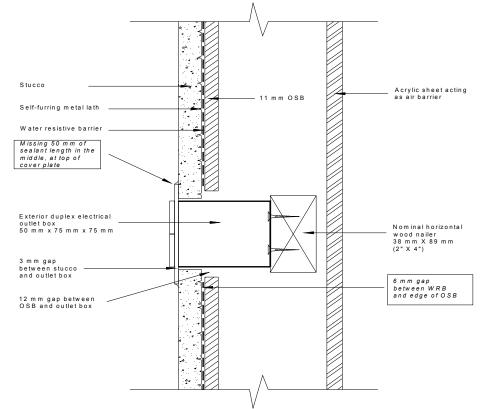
Wall/outlet box detail for specimens No. 1 to No. 4. Vertical section
